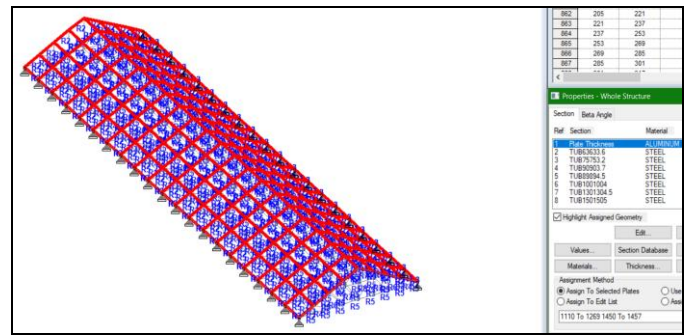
Aluminum Plate Thickness of 0.008mm Provided to the Steel Roof Truss for Tube Section.
